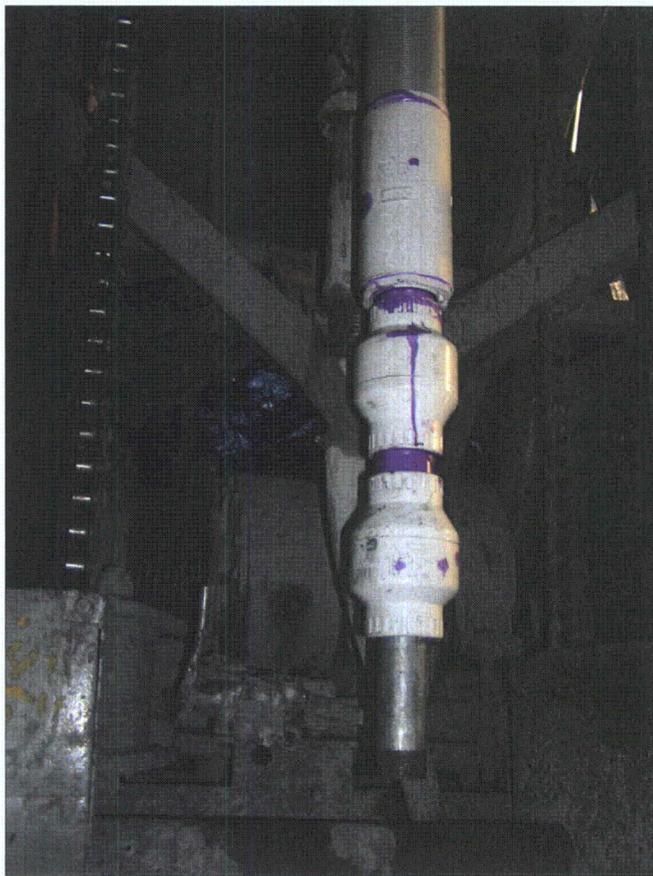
Bottom Screen Assembly and Galvanized Stinger
